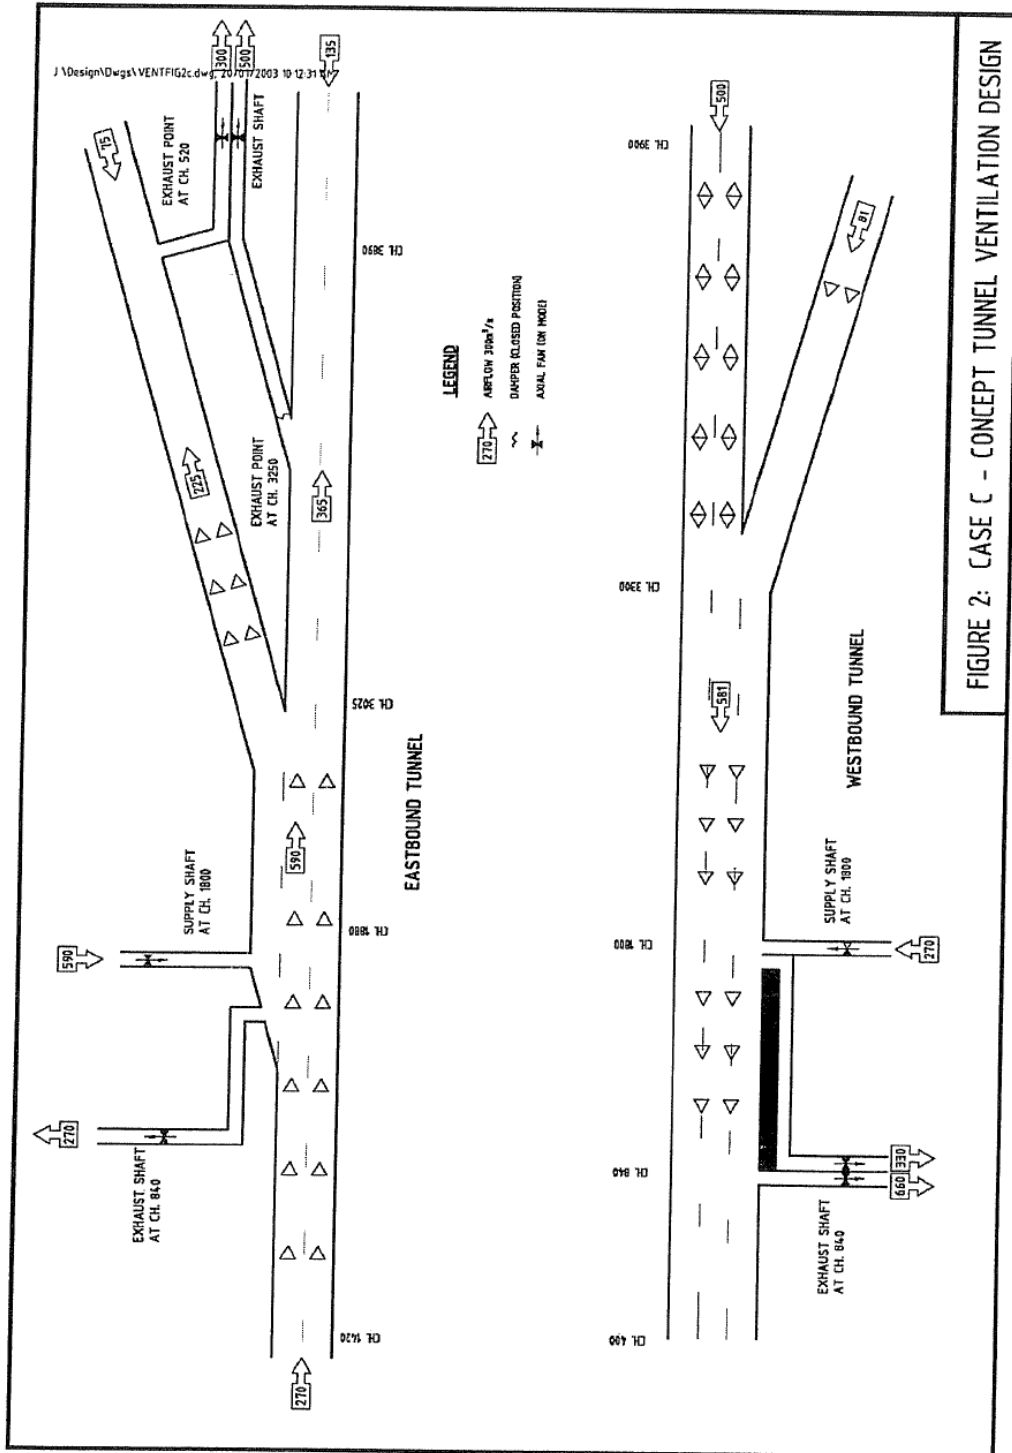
CASE C - CONCEPT TUNNEL VENTILATION DESIGN
